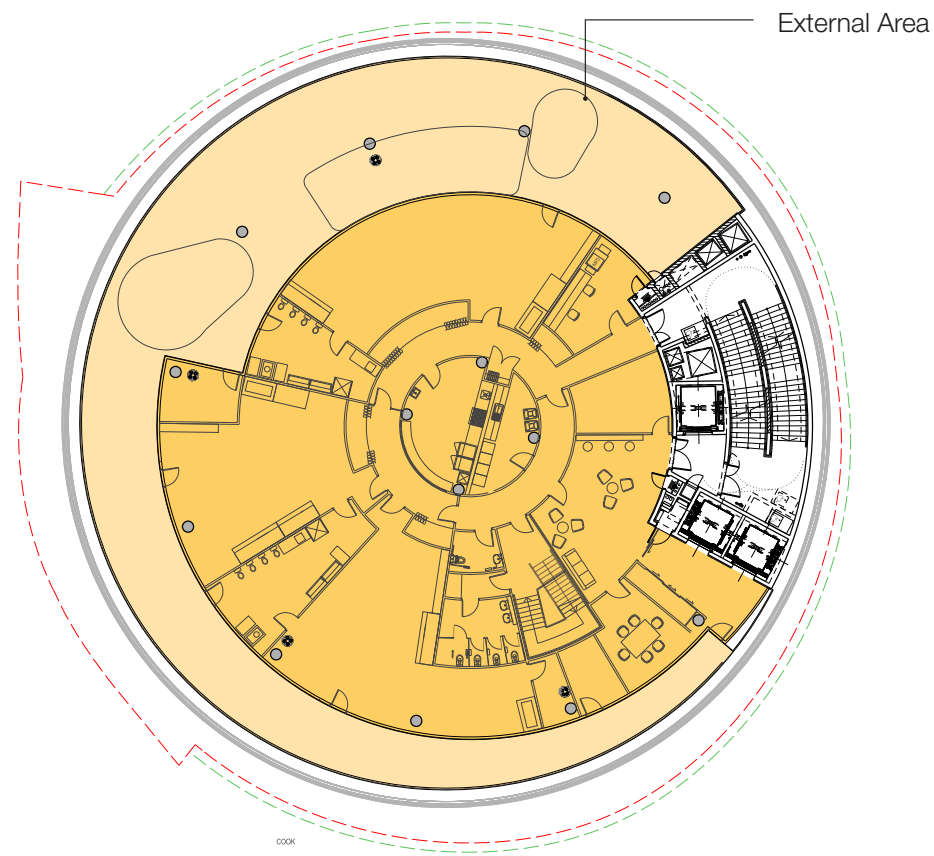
Proposed Level 4 Plan - child care layout
